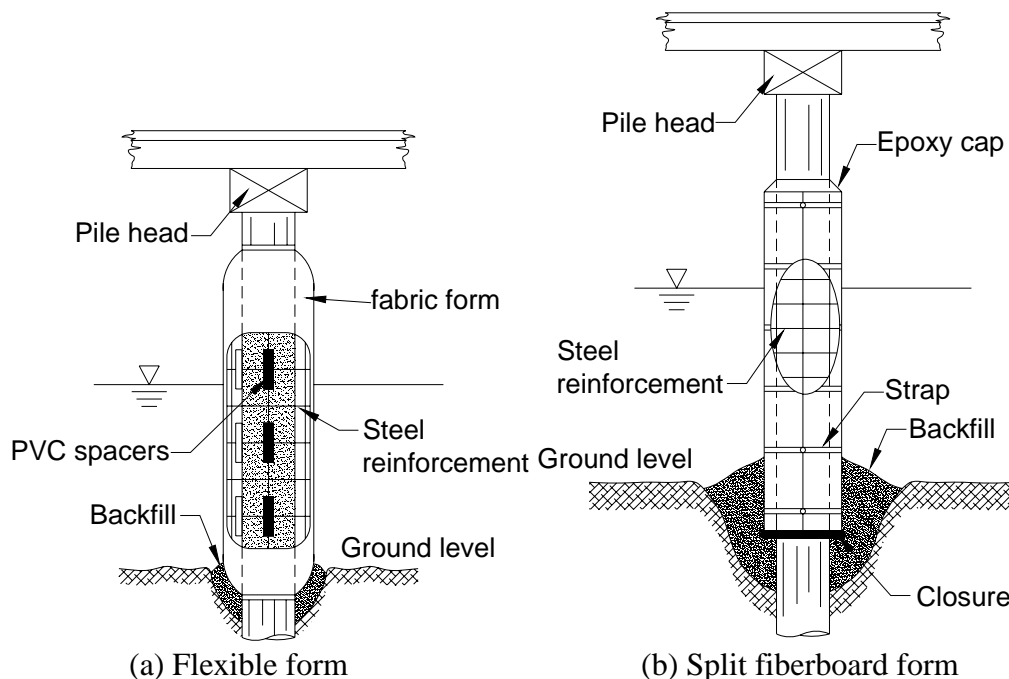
Concrete encasement repairs to timber, steel or concrete piles (U.S. Army Corps. of Engineers et al. 2001)
